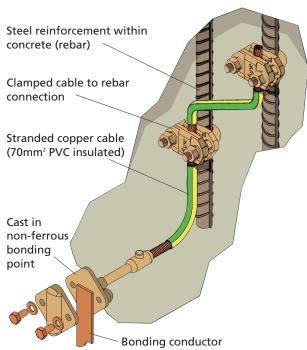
Typical methods of bonding to steel reinforcement within concrete
